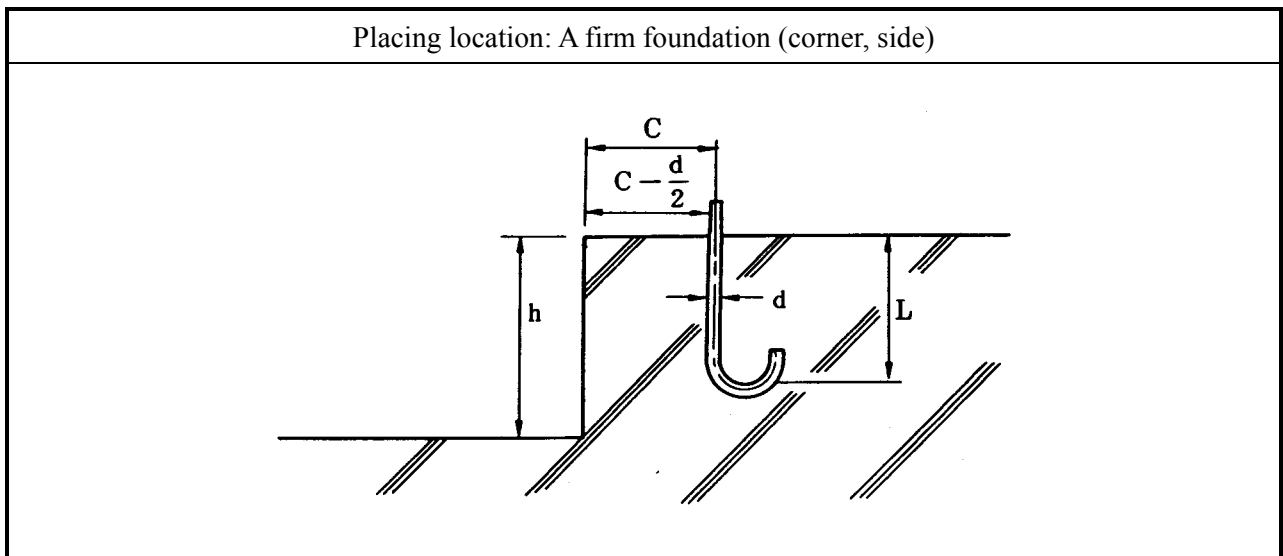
Shear force for anchor bolts that have been placed in the corner or side of foundations.
